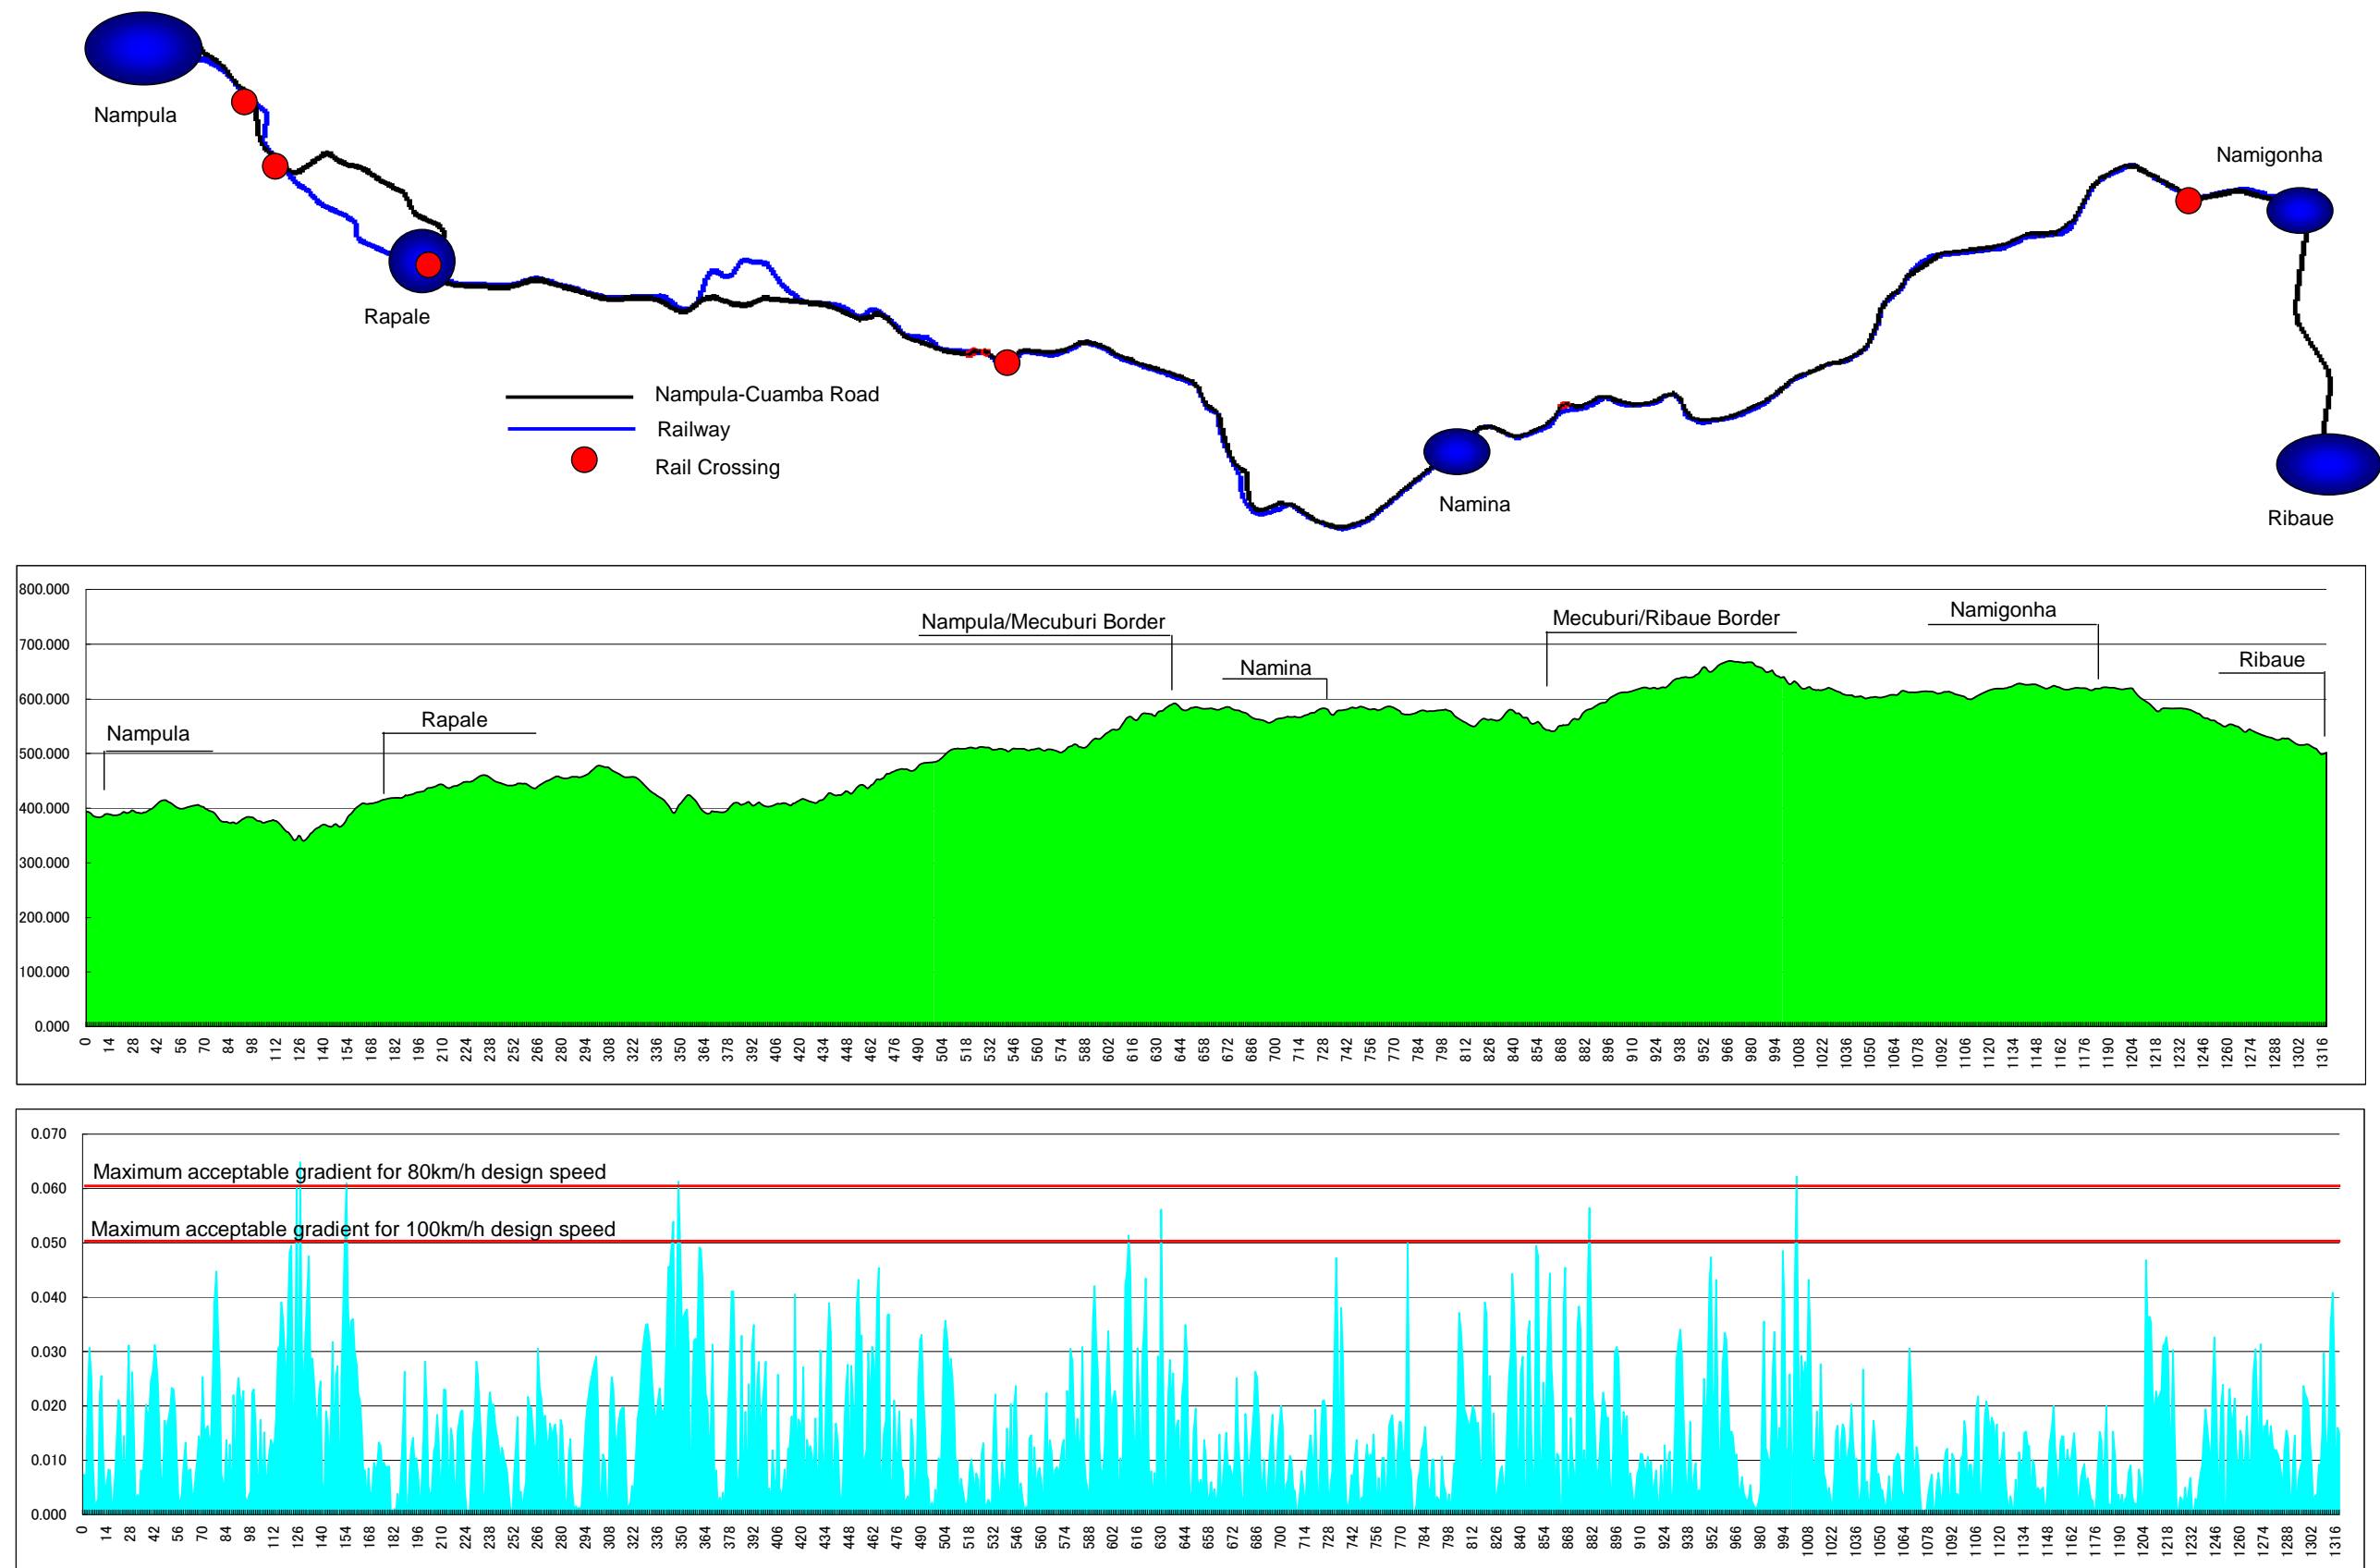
(1) Existing Horizontal and Vertical Alignment (Nampula – Ribare)
